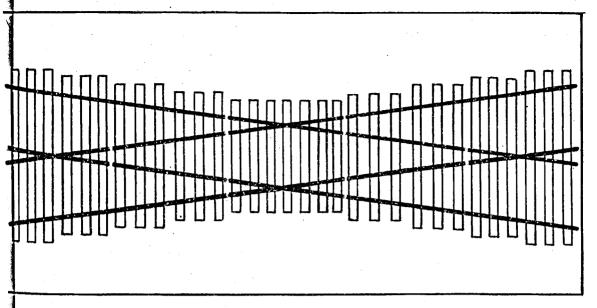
TIMBERING OF DIAMOND LAYOUTS
